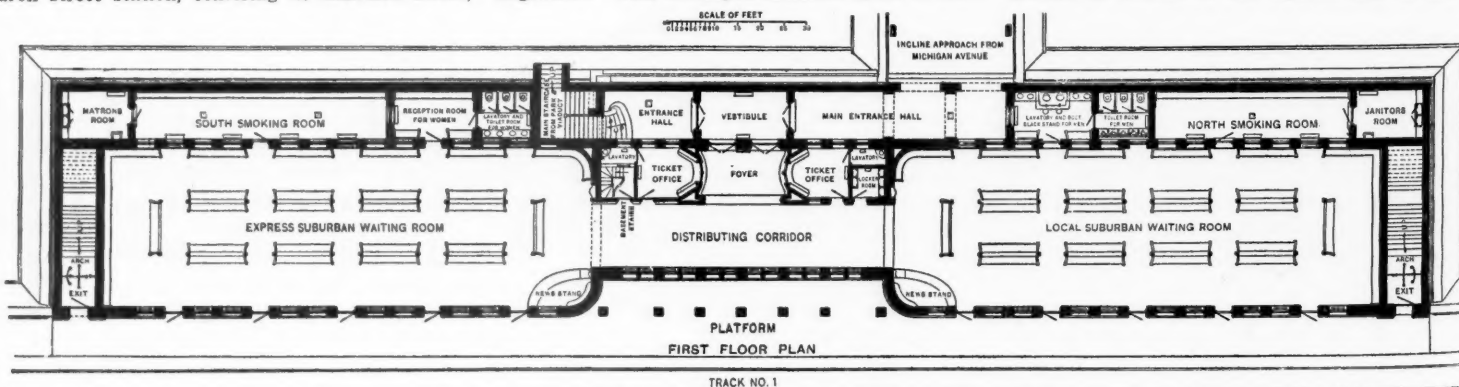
Plan of Suburban Passenger Station at Van Buren Street, Chicago—Illinois Central Railroad.
